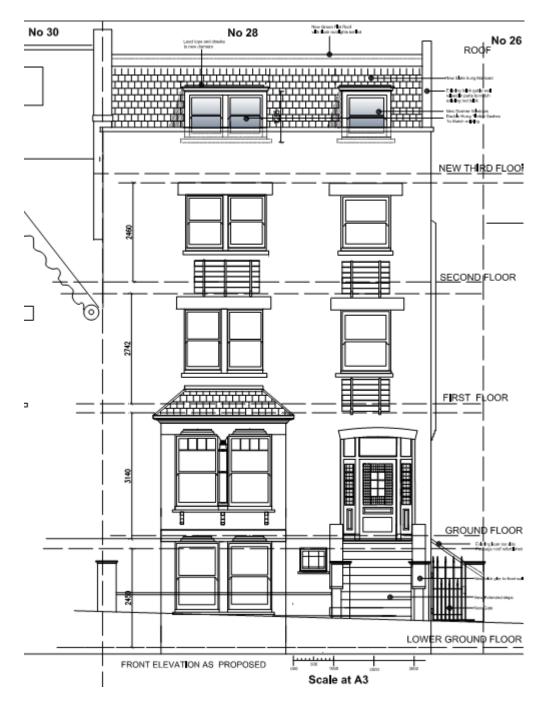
(above): Proposed front elevation (source: Application proposed drawings)
